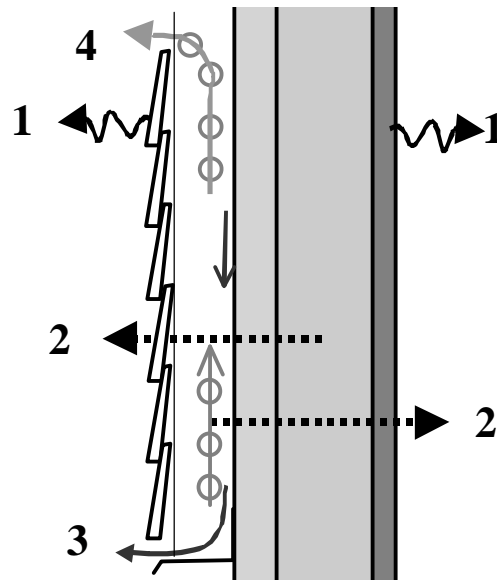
Moisture Removal Mechanism in Drained and Screened Walls
